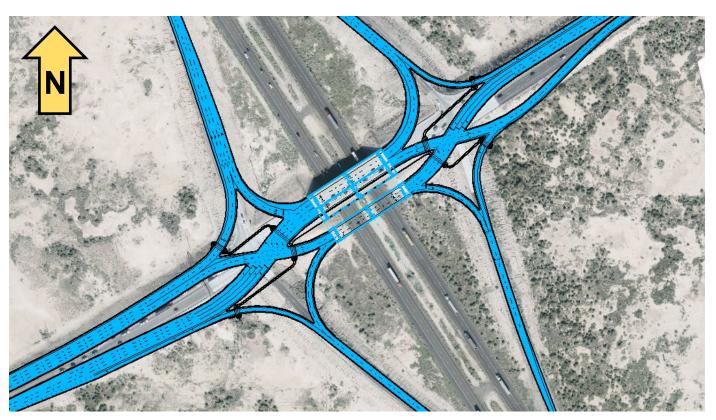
SR 347/Queen Creek Road recommended build alternative
